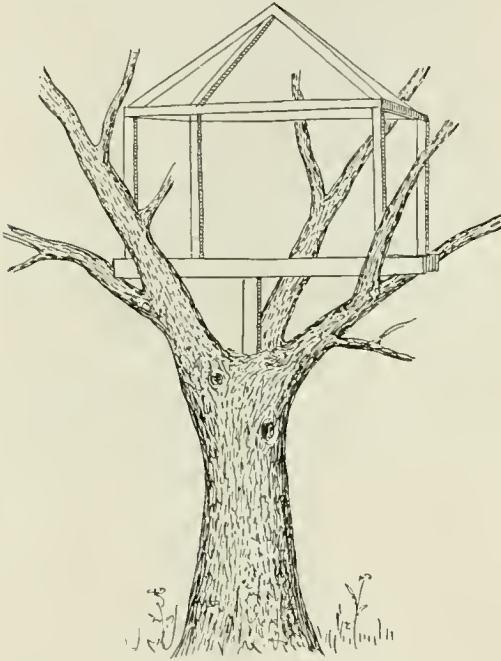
DETAILS OF FRAMING OF A LOW SINGLE-TREE HOUSE.
